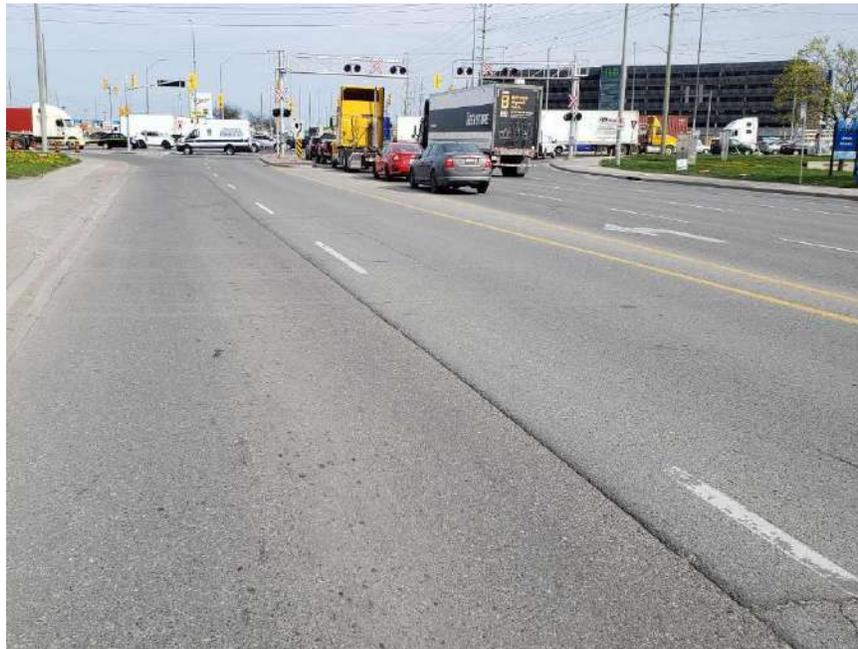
Bramalea Road, Southbound, looking South, approximately 120 m South of East Drive, showing relatively newly paved asphalt concrete.
